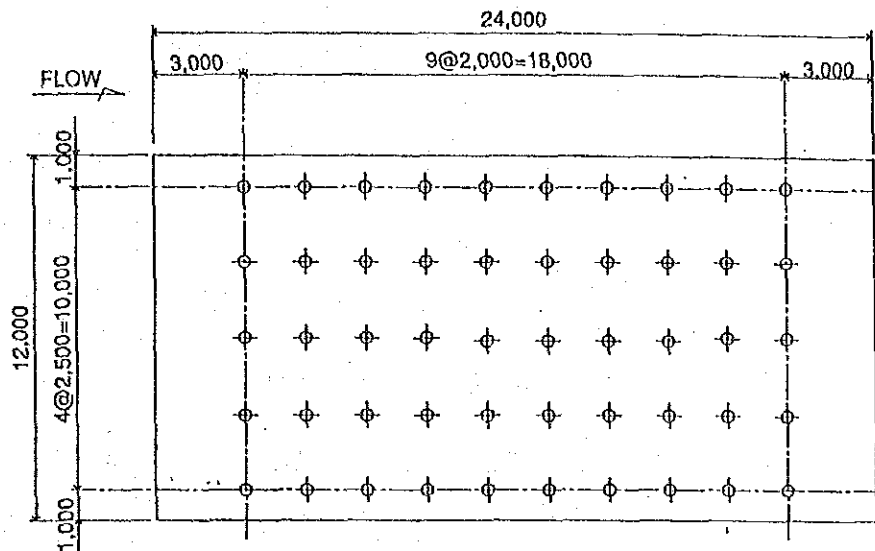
PILE ARRANGEMENT FOR PIERS
